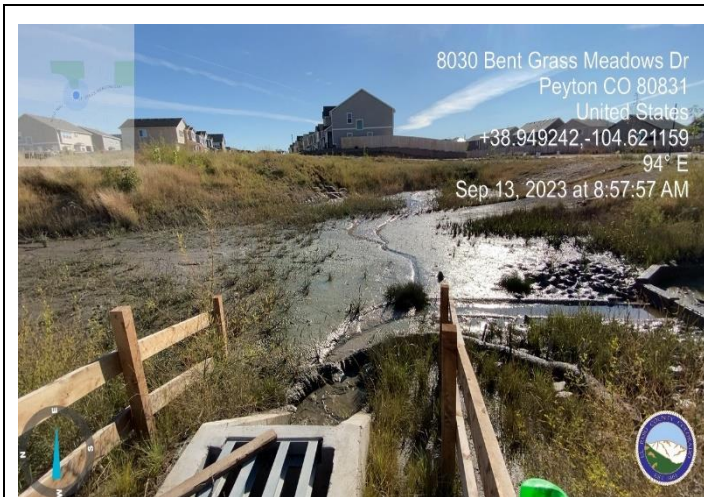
Remove sediment and debris throughout pond. Grade pond to top of trickle channel curb. Grade pond bottom to min 3% slope towards trickle channel.
